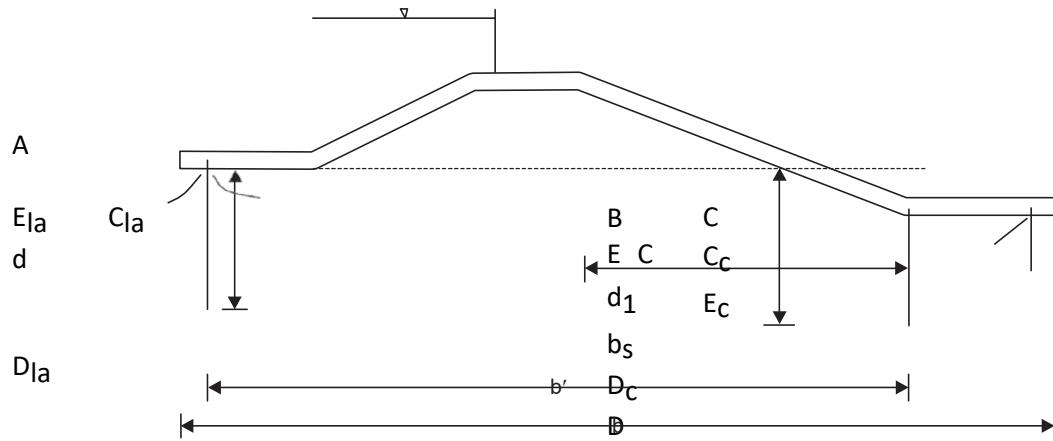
Sketch for mutual interference of sheet piles and for the slope of the floor
